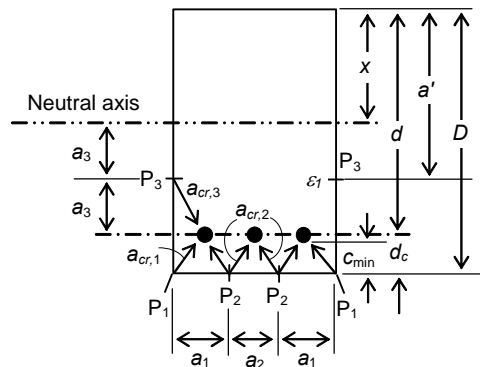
Critical locations for determining flexural crack-width in a typical beam section
